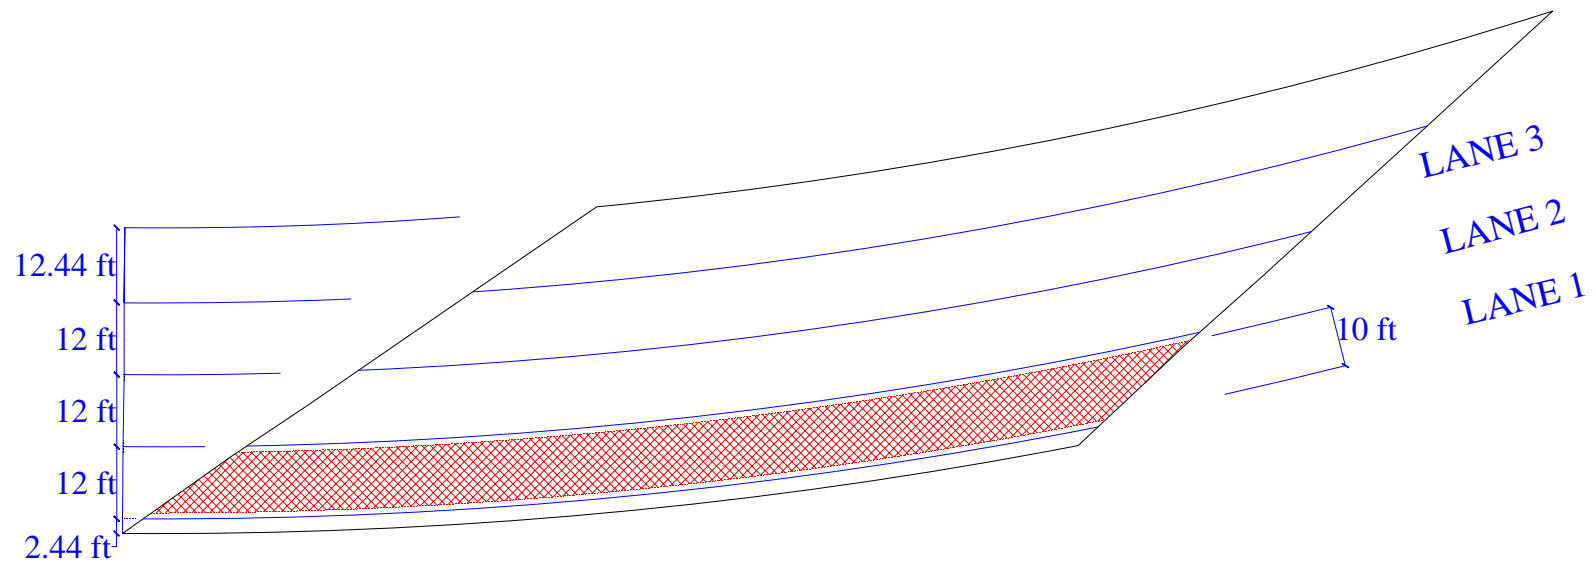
Critical design lane loading to obtain the maximum flange lateral bending stress limit unity check on G3 at G3-S1.
